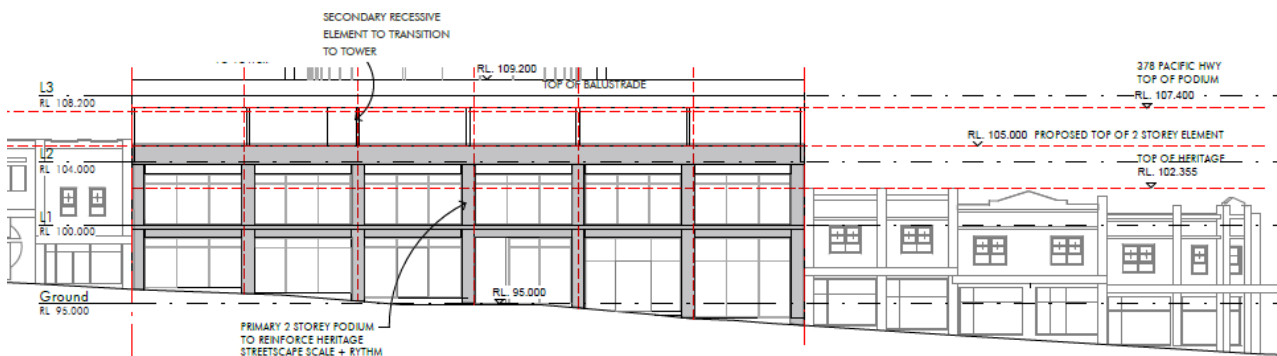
Proposed revised east podium elevation (to Pacific Highway) with a 3m setback from the 2 storey façade (source: Nettletontribe)
